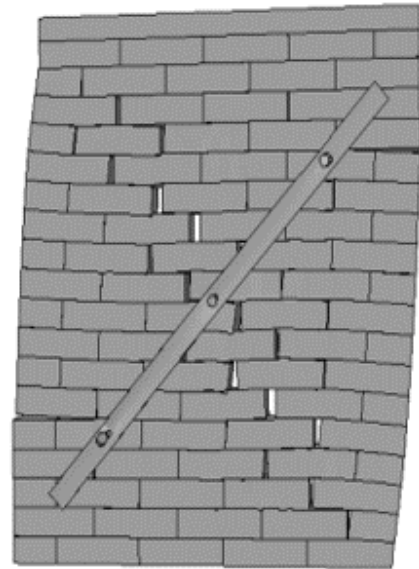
Damage pattern of reinforced masonry wall panel with all units intact (Scale factor = 20)
